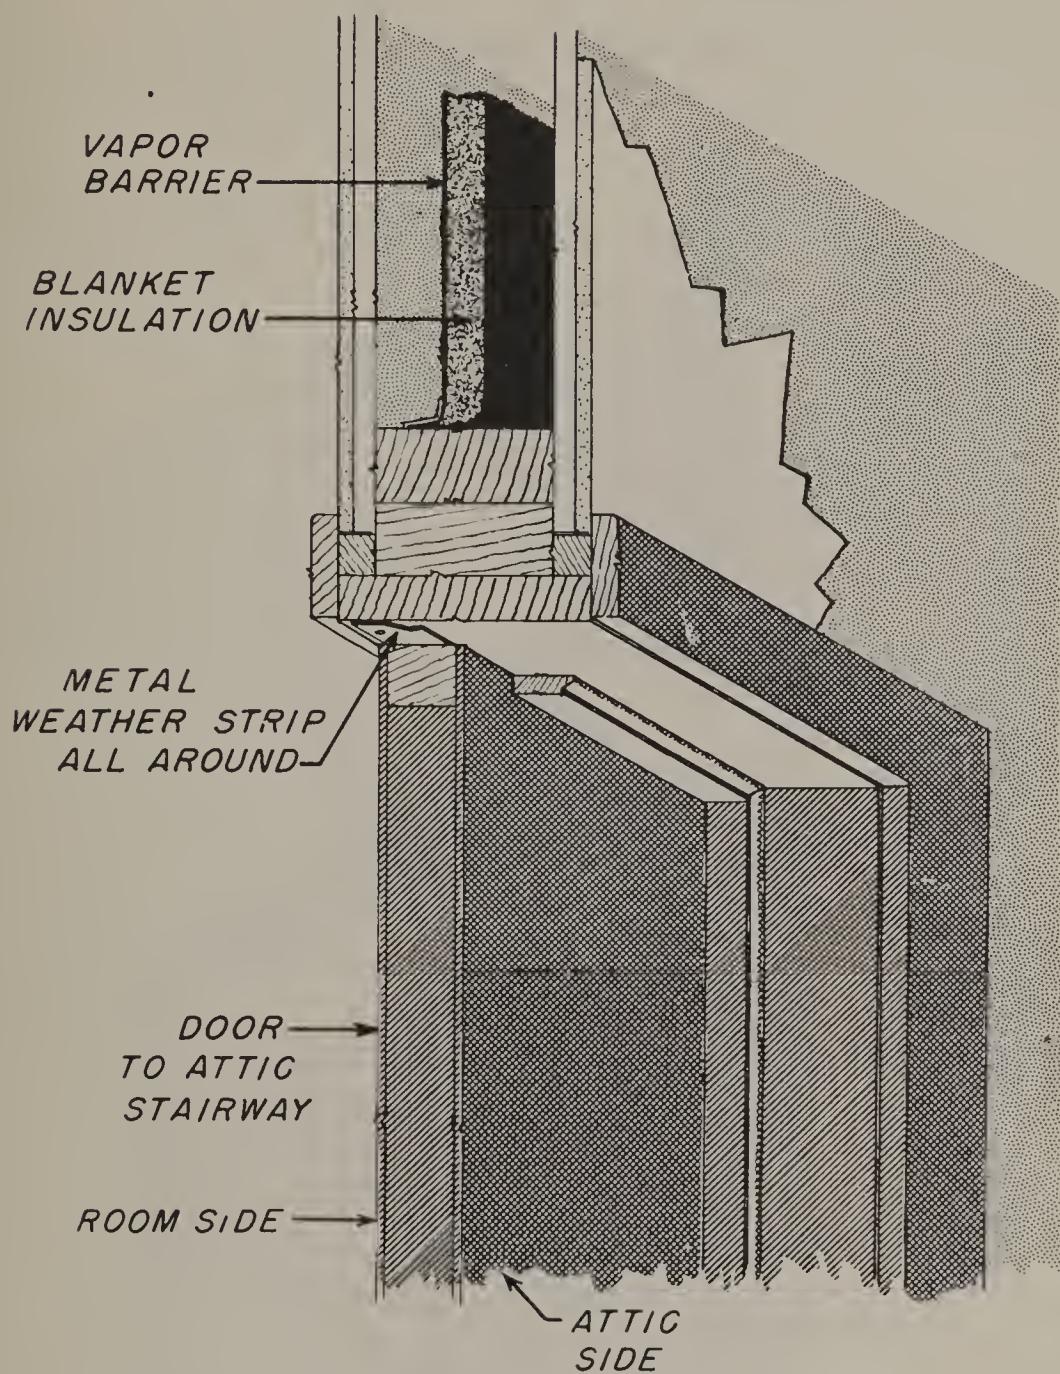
Opening into unheated space, detail No. 1.* Poorly fitted or warped doors and scuttles leading into unheated attic or storage spaces may admit a considerable amount of water vapor and permit unnecessary heat losses. The quantity of water vapor admitted in this way may be reduced by fitting doors to door stops carefully by the use of weather strips or other seals. Thermal insulation may be advantageously added to the backs of doors adjacent to cold spaces.
